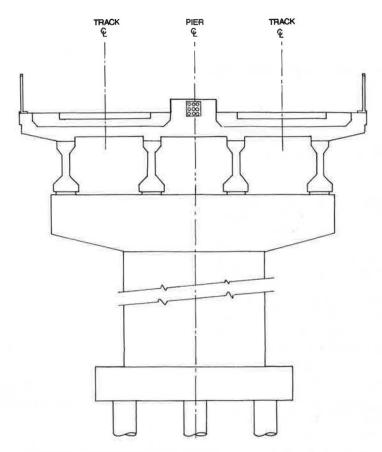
Typical section, AASHTO beam span ballast deck.
